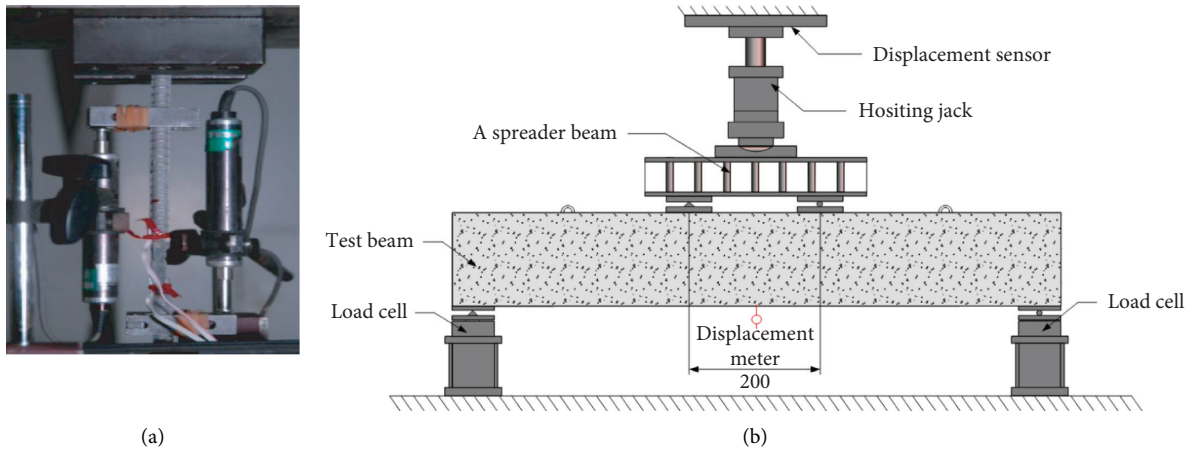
Material and structural tests. (a) Tensile tests of reinforcements. (b) Shear bearing capacity tests of beams.
